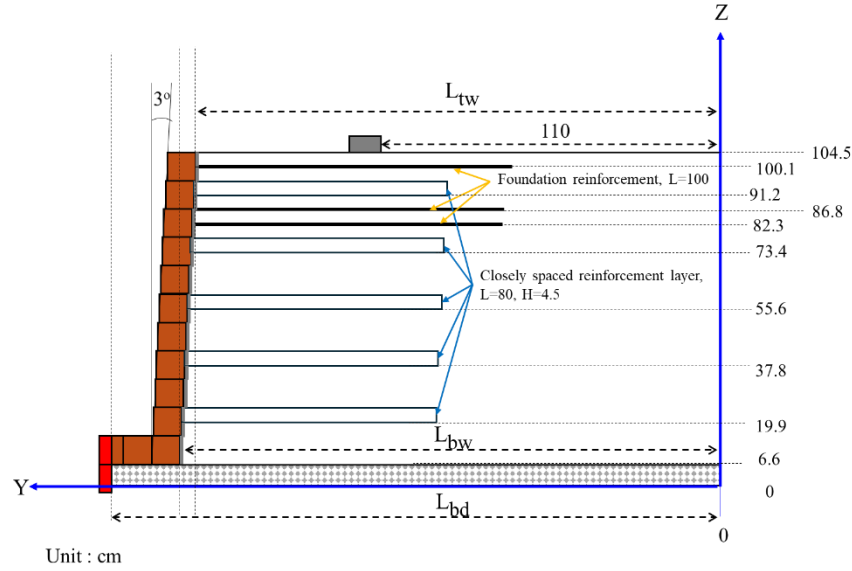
Schematic diagram of a constructed model GRS bridge abutment. Note: Abutment height was the same in all models
